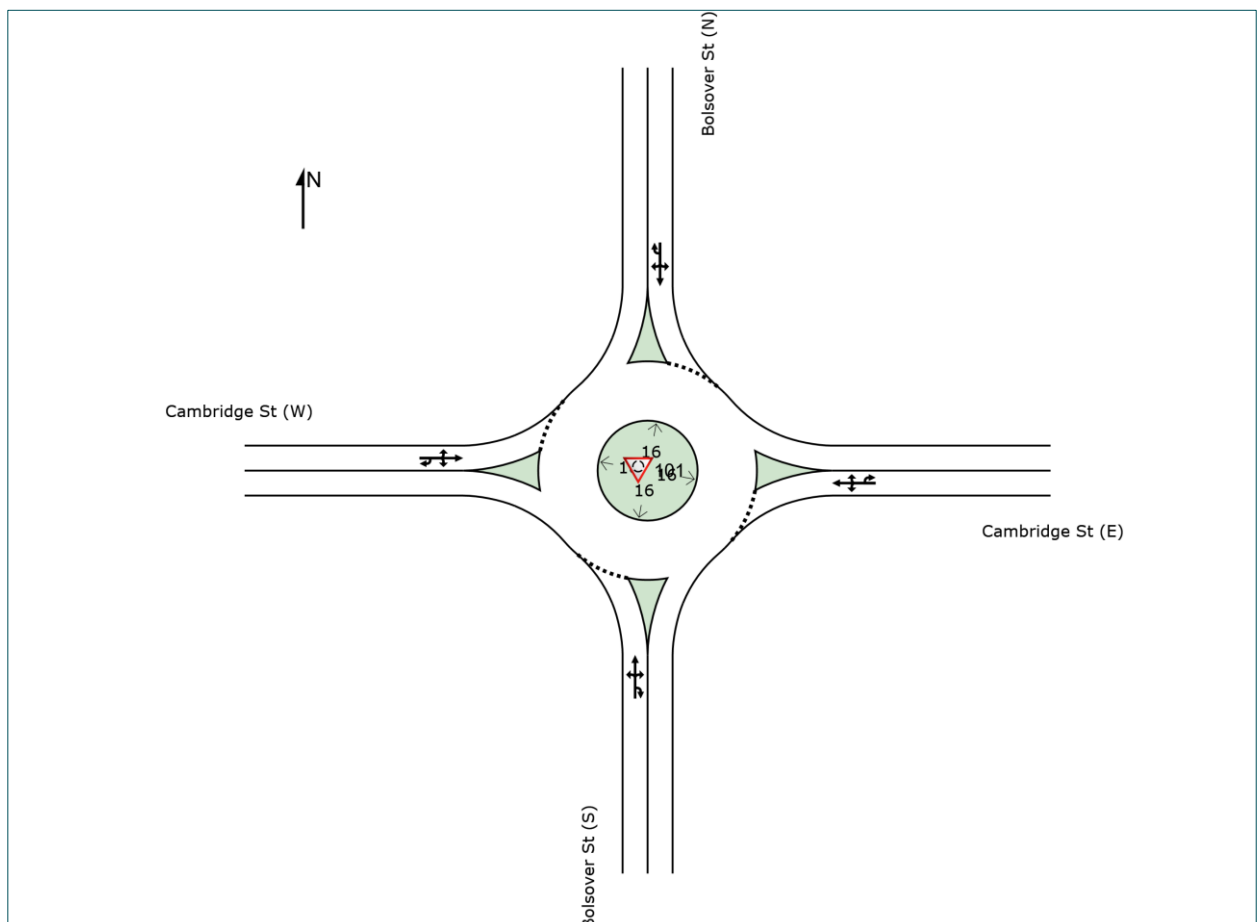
Existing Bolsover Street / Cambridge Street SIDRA layout
